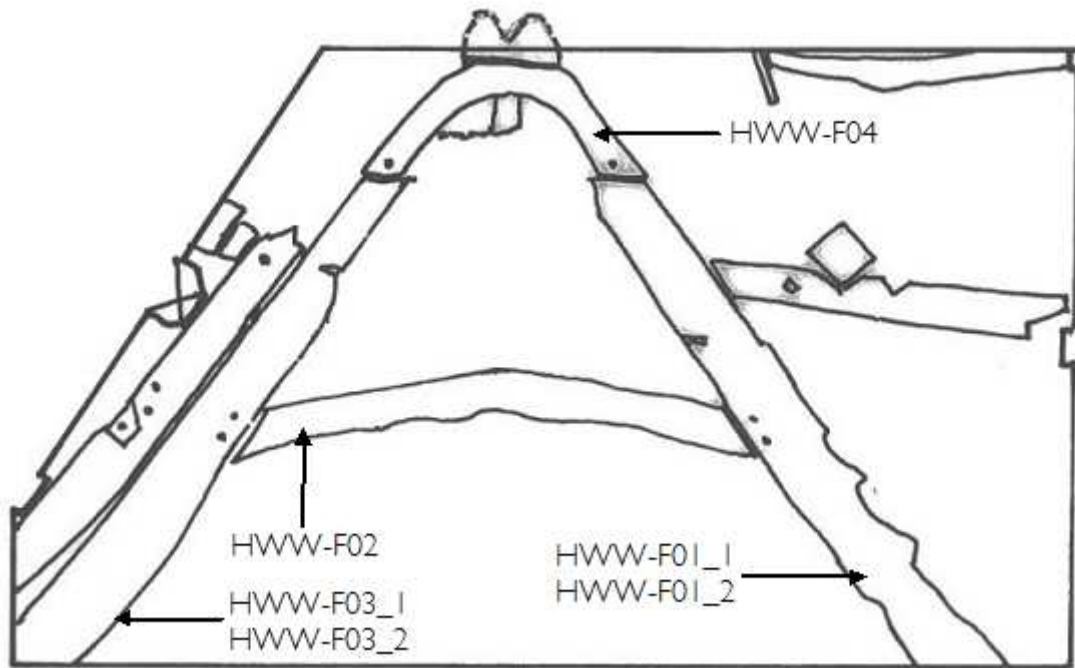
Truss B west face sample locations (based on a drawing by C Carter of the Wiltshire Buildings Record)
